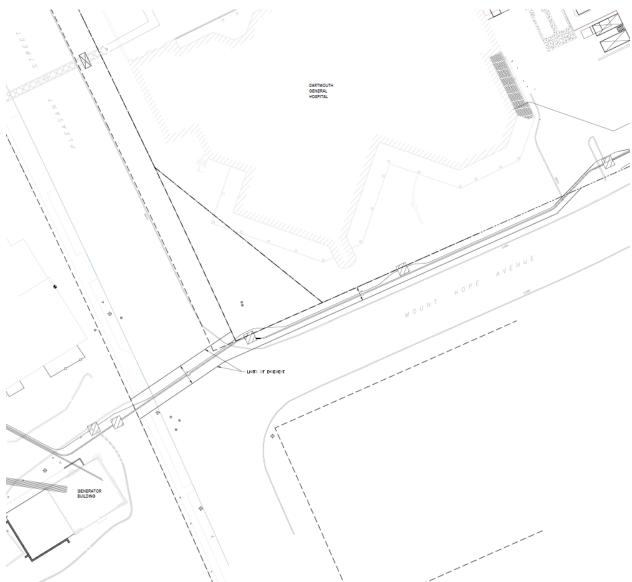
Zoomed in section of the engineered plan showing the location in plan view of the proposed encroachment
